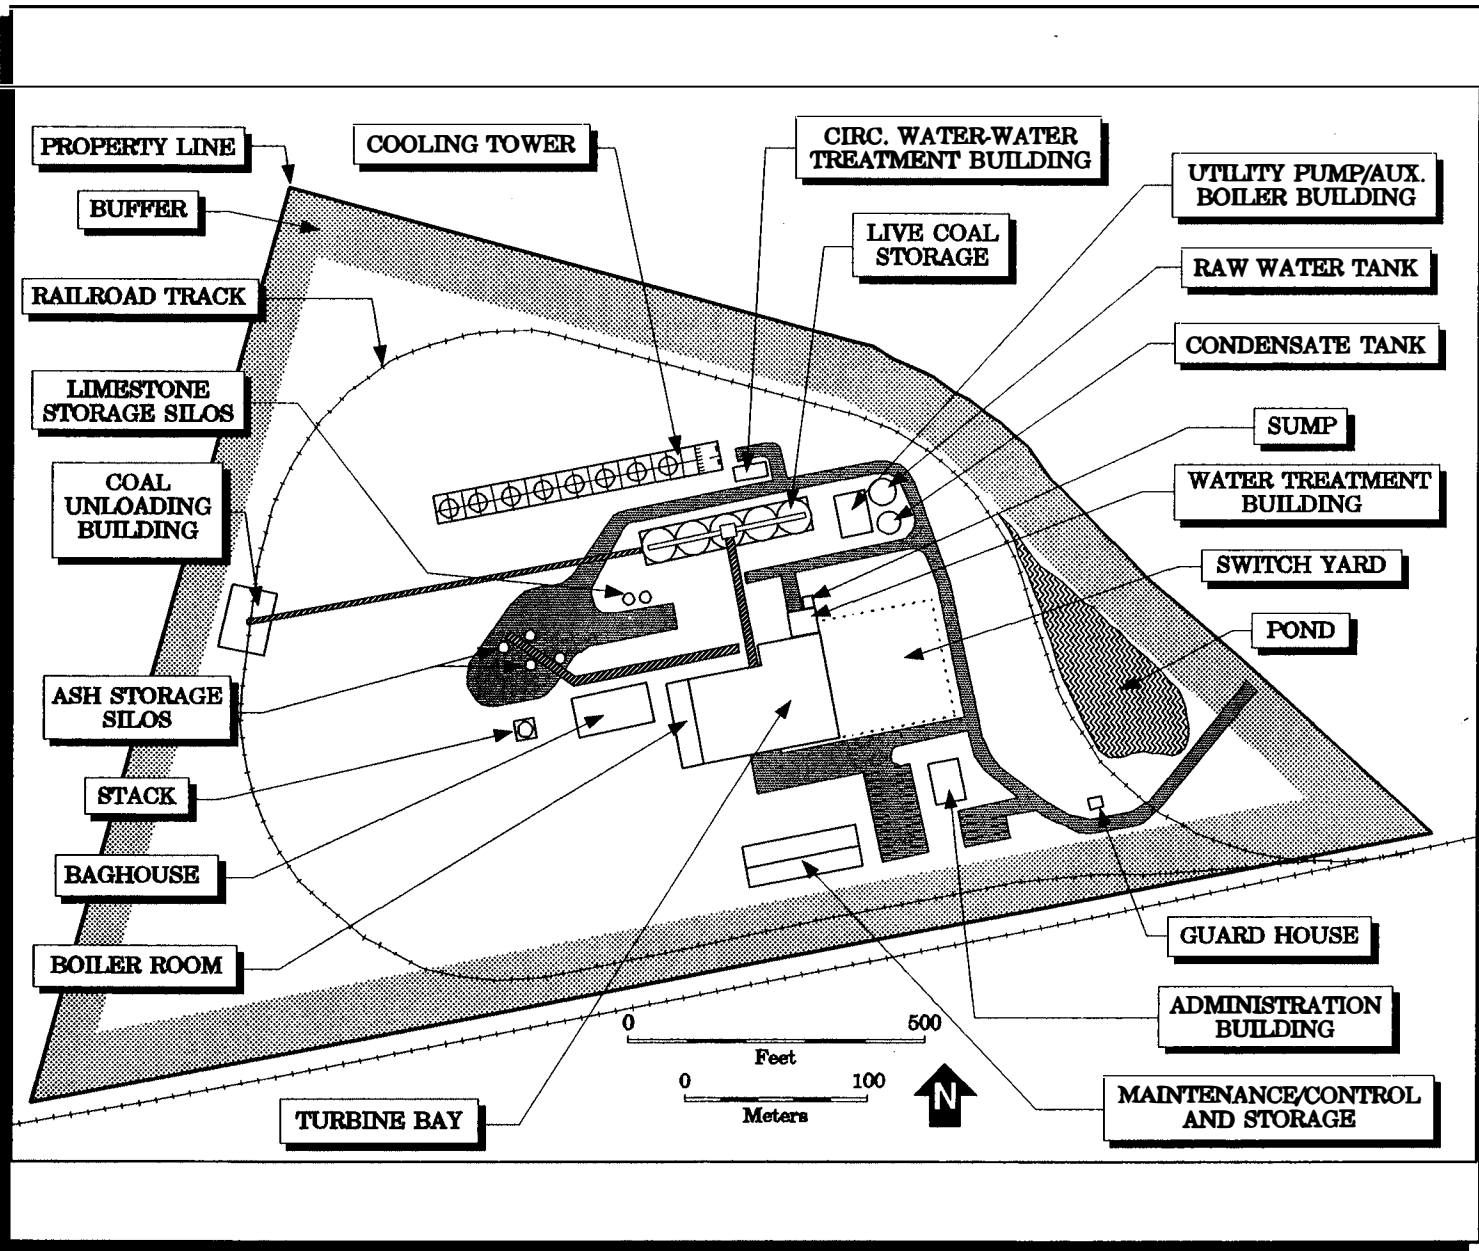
Proposed YCEP Cogeneration Facility site plan for the West Manchester Township site. Source: ENSR, 1992.
